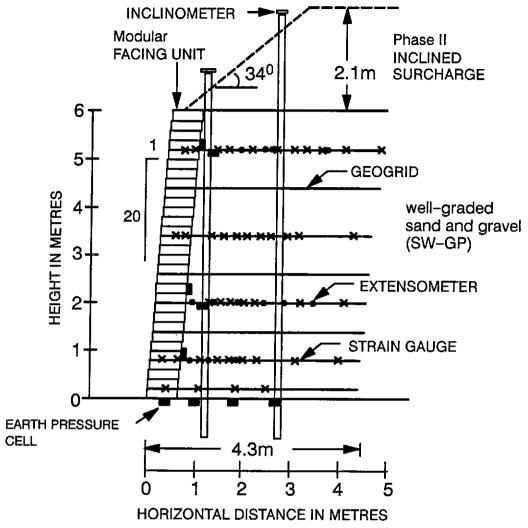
Instrumented geogrid reinforced soil wall with modular facing units (Simac et al. 1990)
